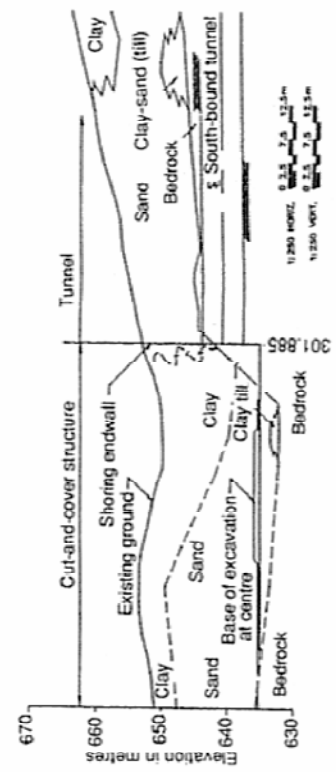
Excavation for tunnel portal at Edmonton, Canada—detailed stratigraphy of the portal area.<sup>72</sup>
